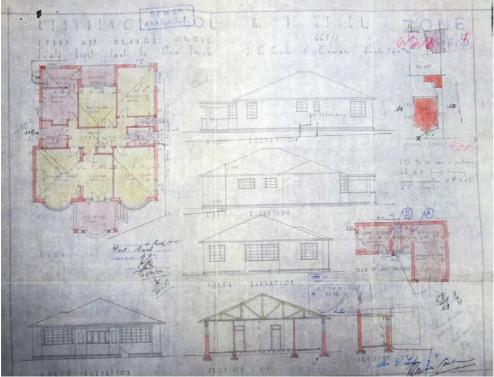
Plan for proposed residence on Stand 459, Orange Grove from 1937 Good example of three bedroomed single storey residence with corrugated iron roofing and centrally located front stoep
